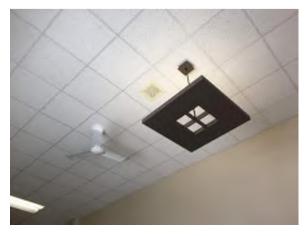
2x2 ACT ceiling in 2012 entryway in excellent condition.
